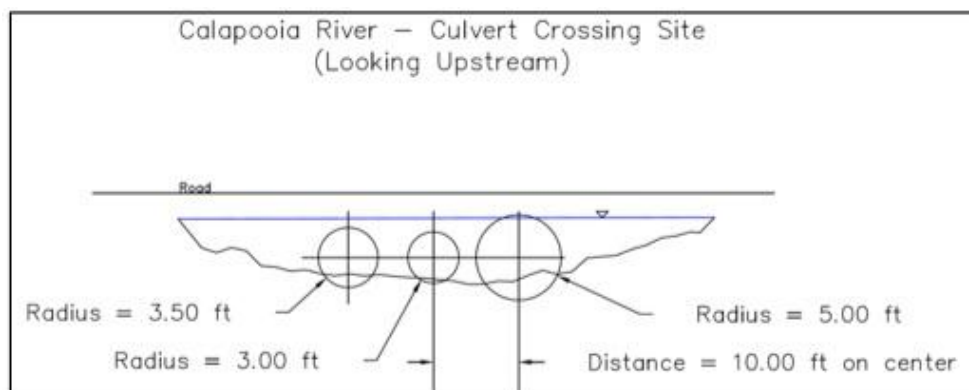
Downstream cross-section of current culvert location and culvert crossing orientation.
